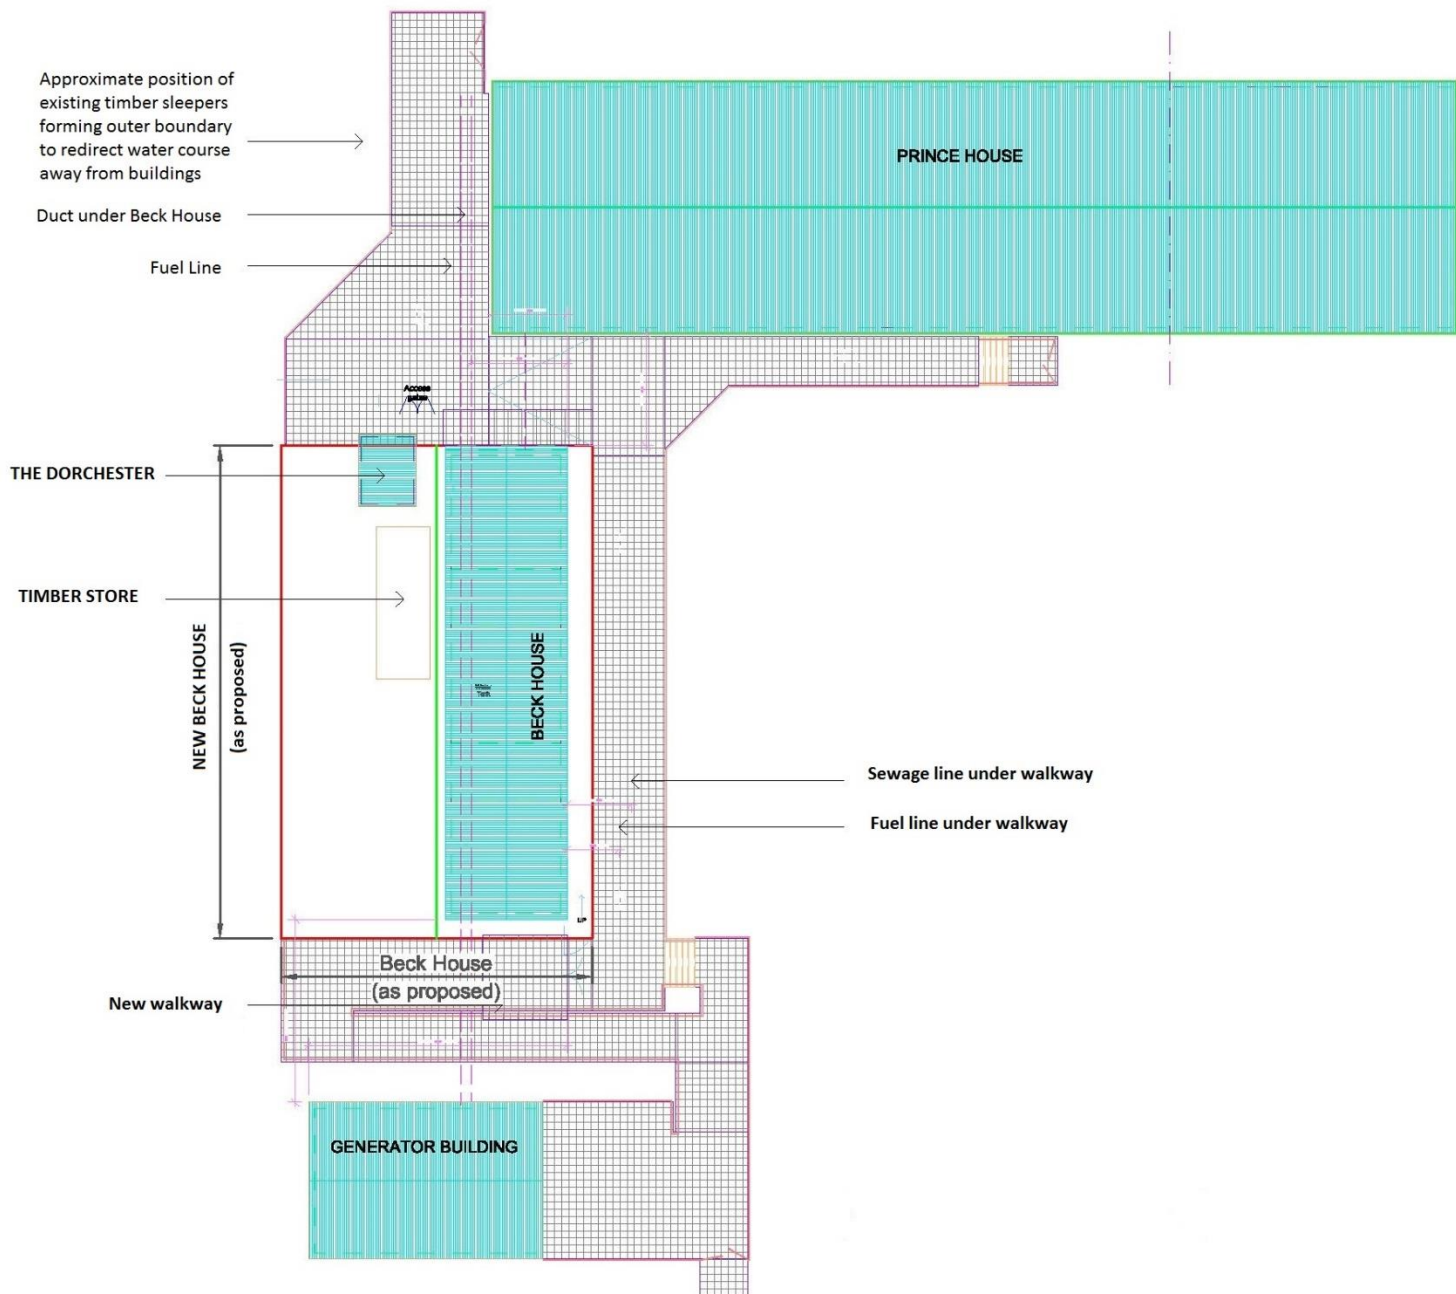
Bird Island existing buildings (green) and proposed buildings (red outline)
